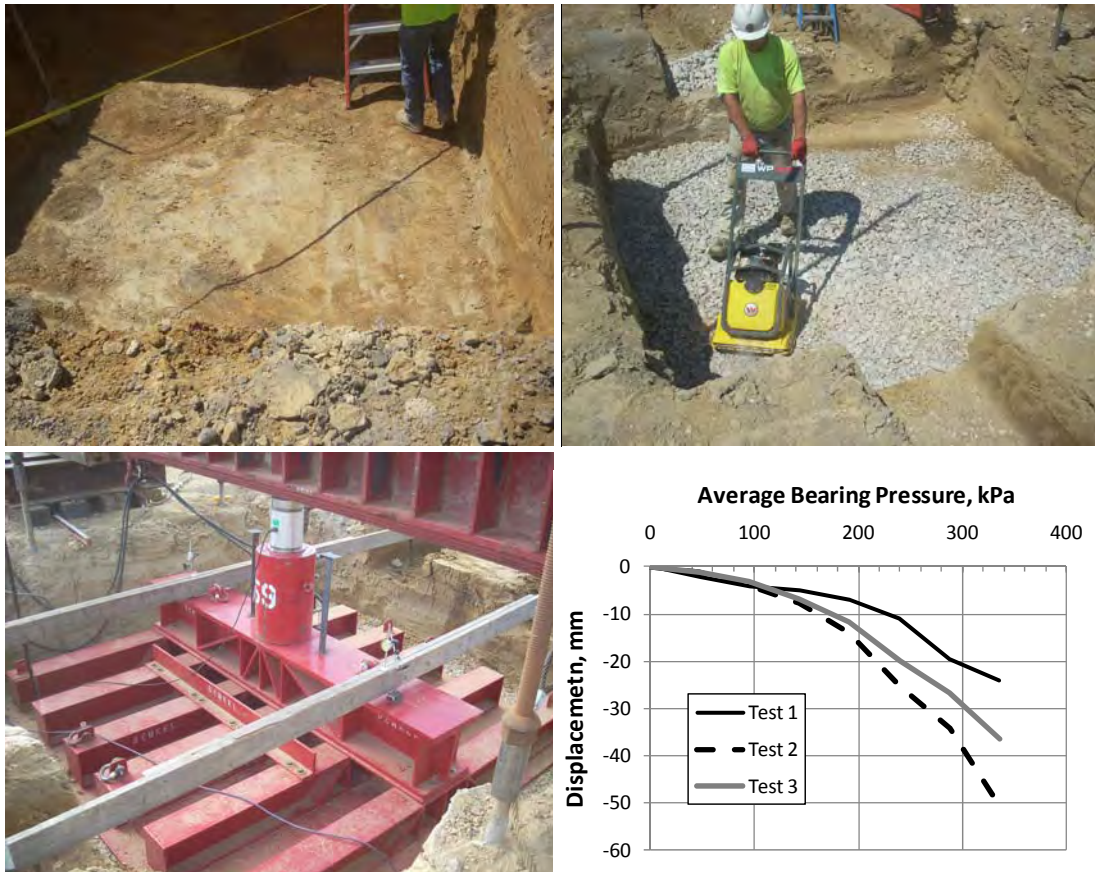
Load Tests of Drilled Displacement Columns Supporting a Conventional Spread Foundation
